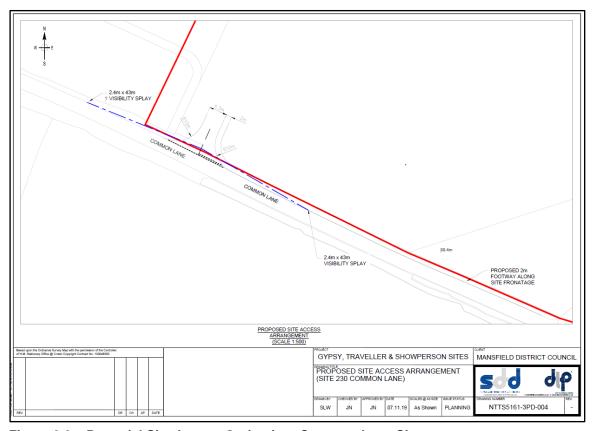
Potential Site Access Option into Common Lane Sites
